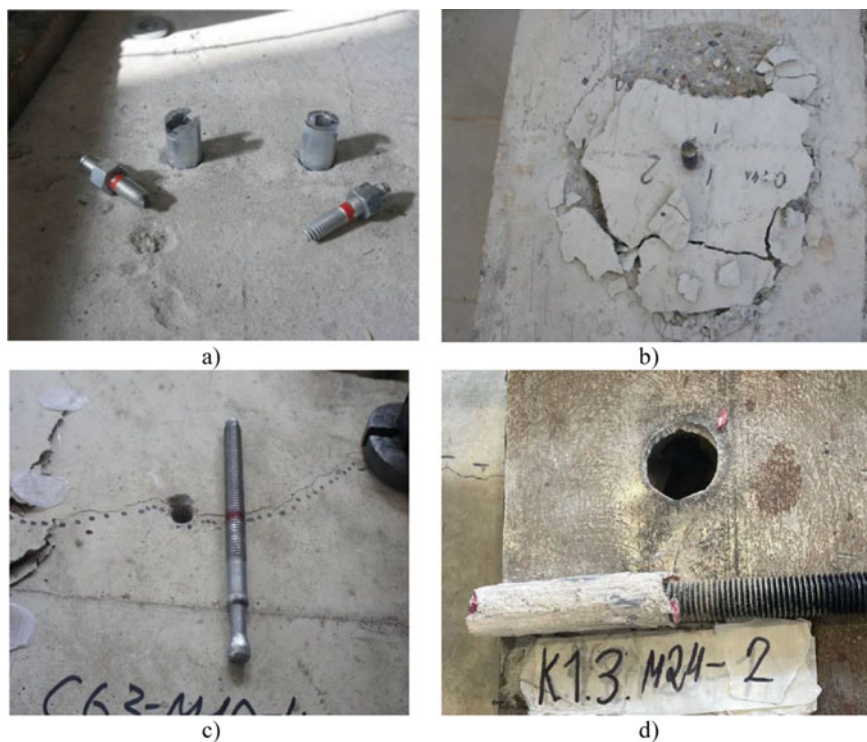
Anchor failure mechanisms: a steel failure; b concrete cone failure; c slippage failure; d failure at the interface between the adhesive composition and the base
